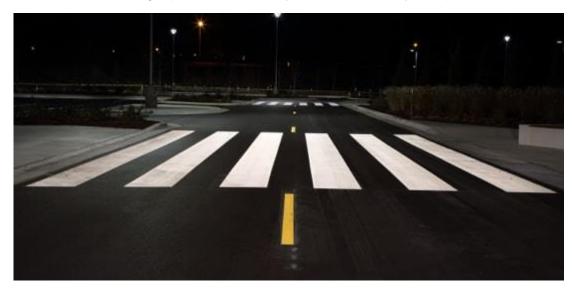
Example of High Visibility Pavement for Crosswalk Treatment⁶
